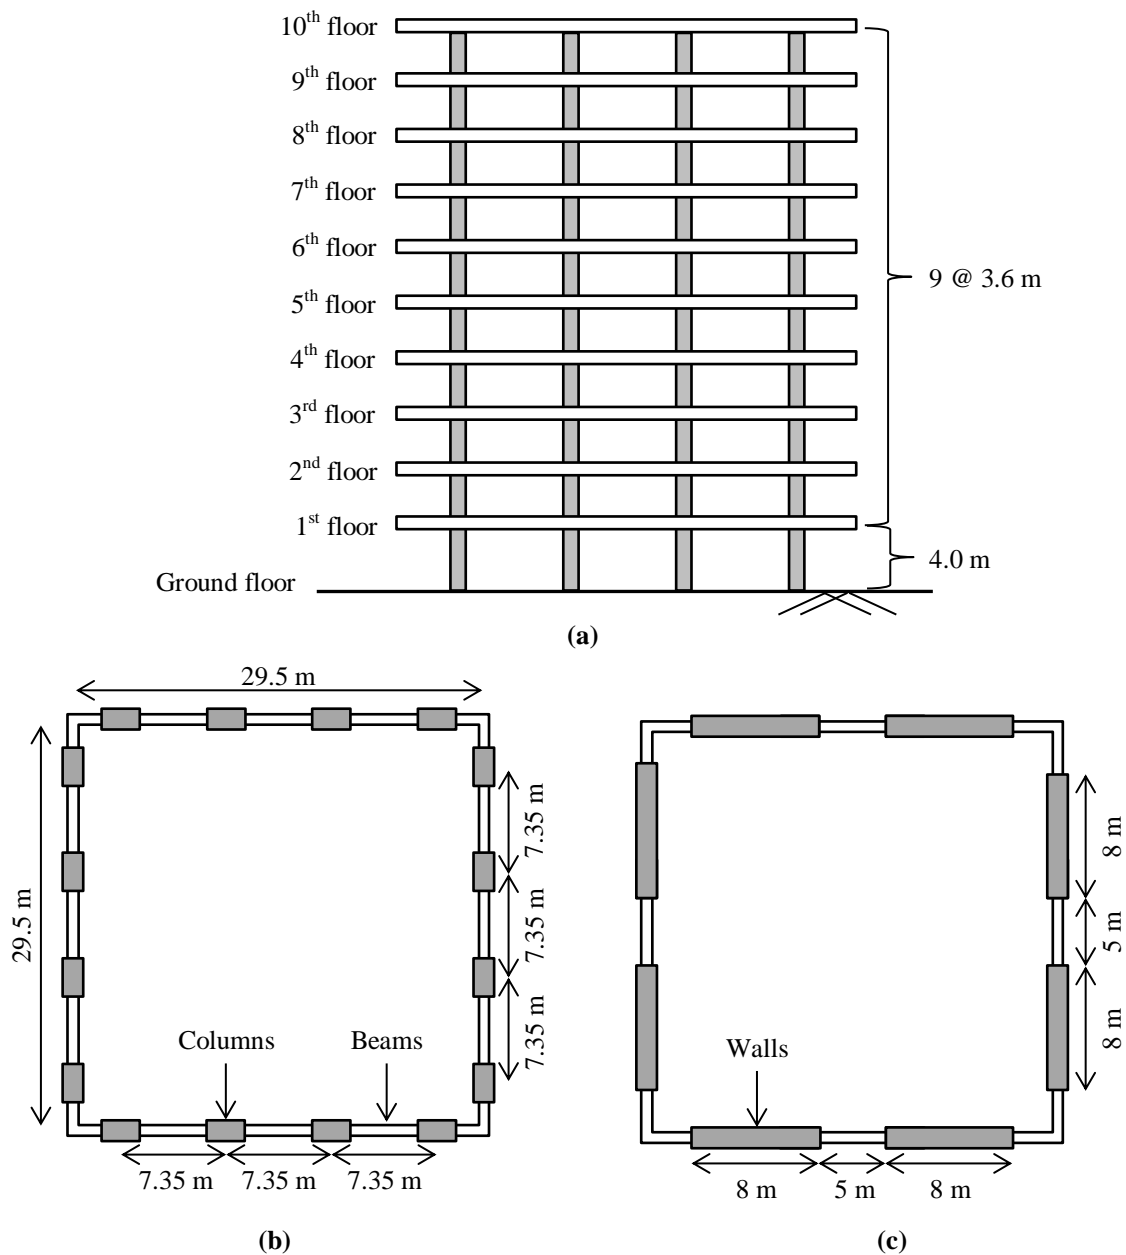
Elevations of the buildings considered; (a) front elevation, (b) frame building plan, and (c) wall building plan
